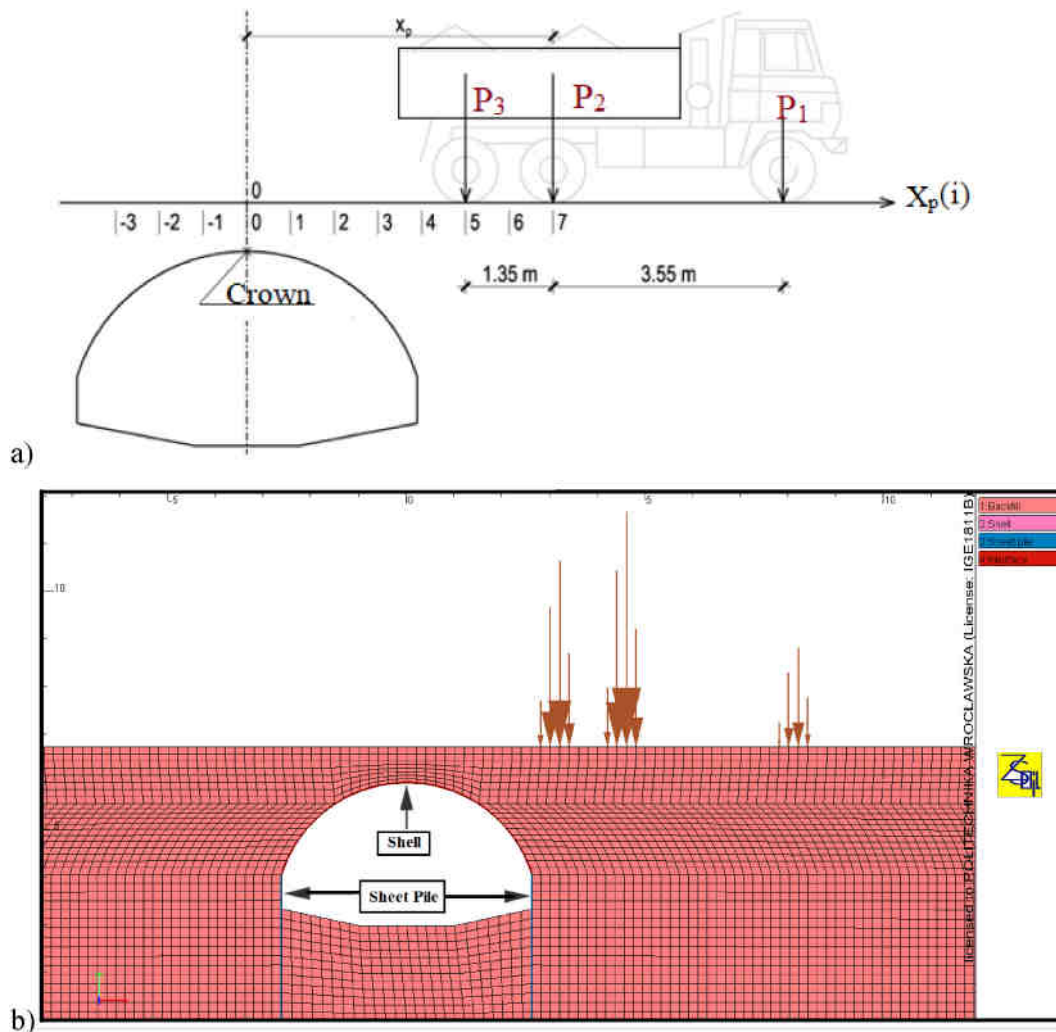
Loading arrangement, a) for test b) for numerical modelling.
